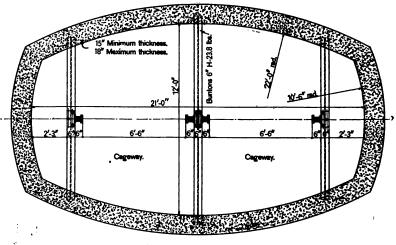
Elliptical Concrete Hoisting Shaft, With Steel Ship-Building Channel Buntons. 6" H-sections weighing 23.8 pounds per foot spaced 6 feet apart. The guides are likewise made of 6" H-sections and
